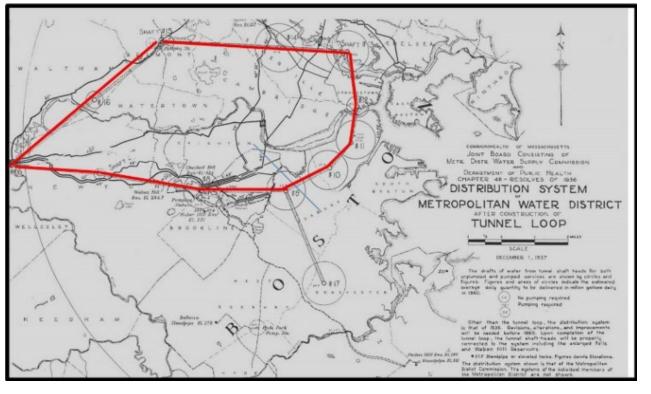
Proposed Metropolitan Water District Tunnel Loop plans, the red line highlights the proposed tunnel loop (MWRA collection).
